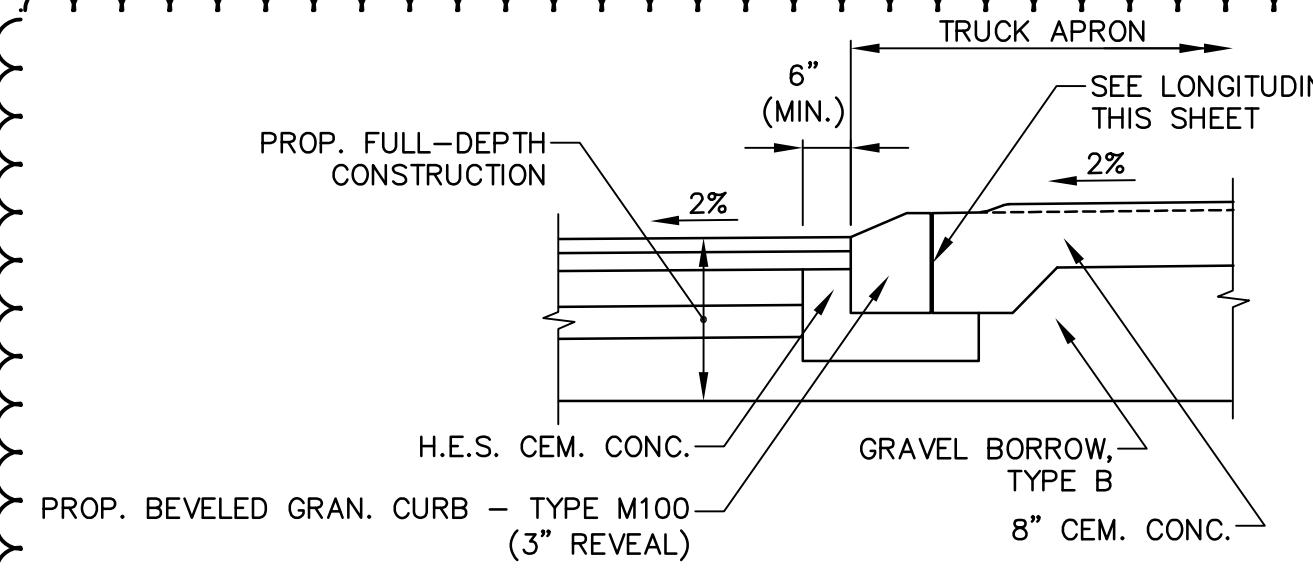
DETAIL FOR TRUCK APRON TRAVERSE EXPANSION JOINT
